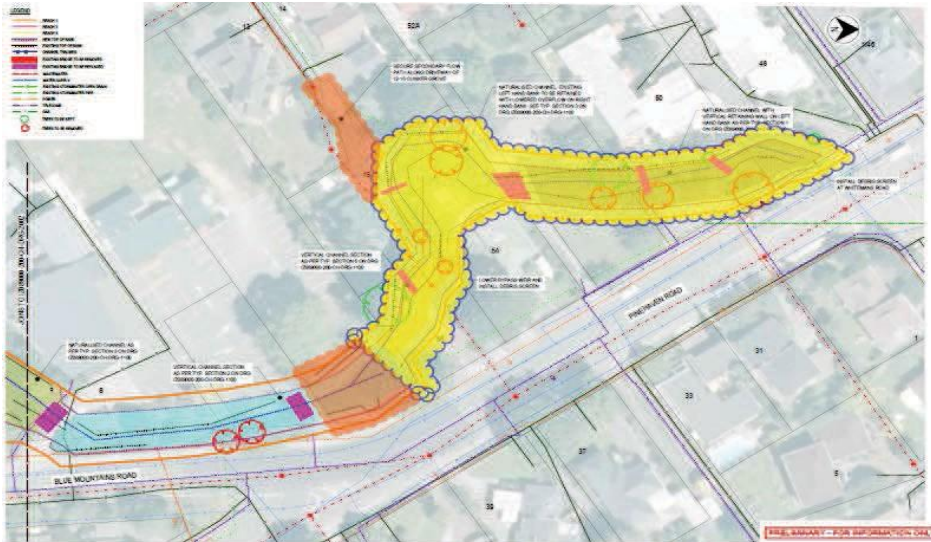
Stage 1 Works Adjacent to Pinehaven Road.
